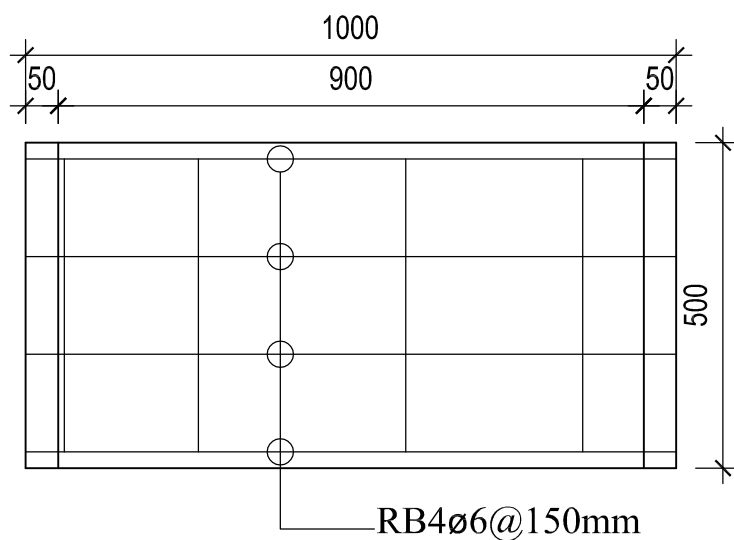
DETAIL REINFORCEMENT FOR RC PIPE AND COVER
